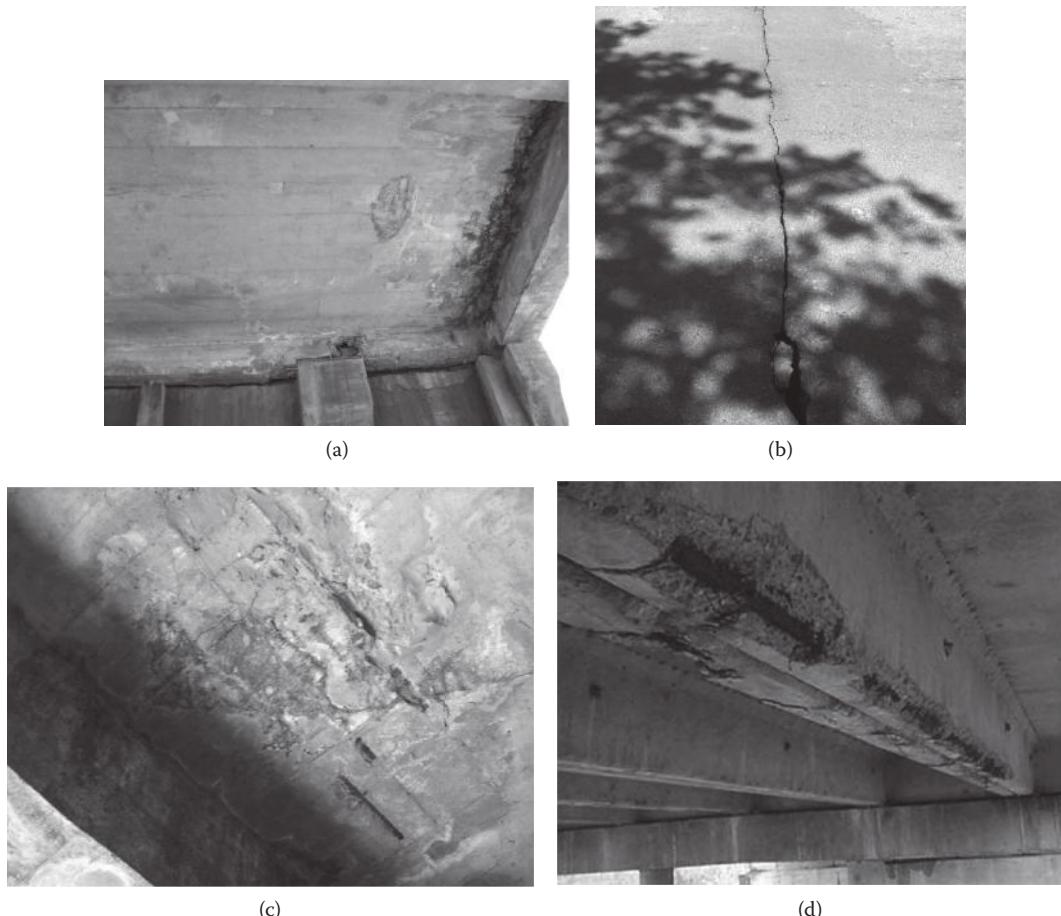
Damages for concrete bridge superstructures: (a) bottom deck cracking corrosion, (b) top deck cracking, (c) exposed rebar, (d) reinforcement corrosion.
